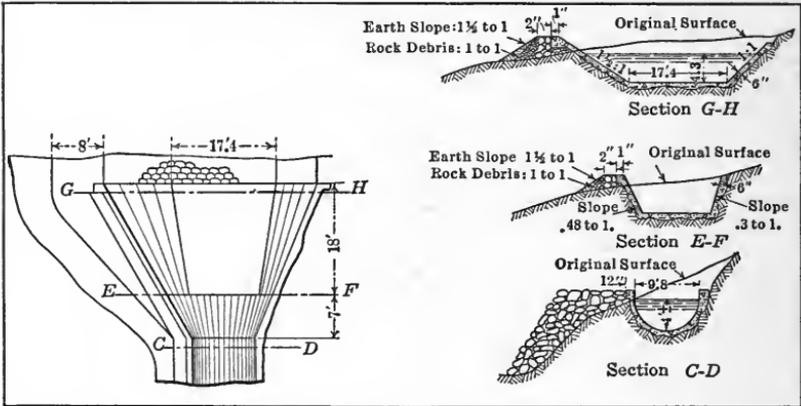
Transition from earth to concrete-lined section. Umatilla Project, Ore.
